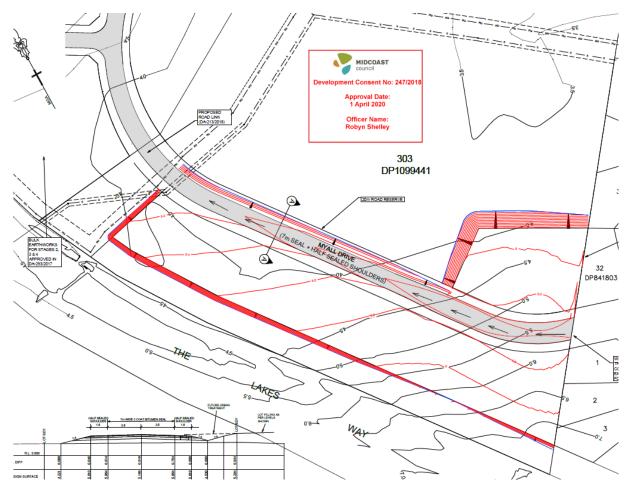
Extract of approved bulk earthworks plan detailing finished levels over the area of proposed Lots 1-16 and extension of Myall Drive
